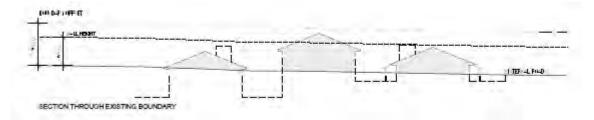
Elevations showing the buildings in relation to the levels on Hocking Parade (grey shading is above the street level of Hocking Parade).
